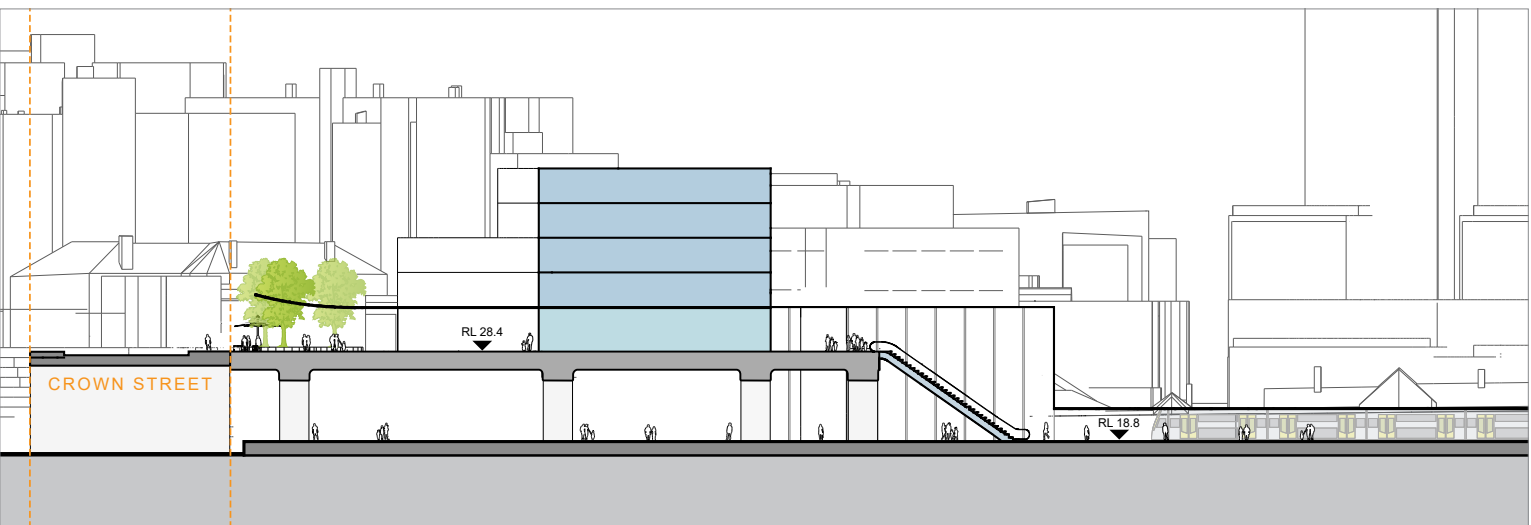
Diagrammatic section showing potential Crown Street gateway development, plaza and platform connection
